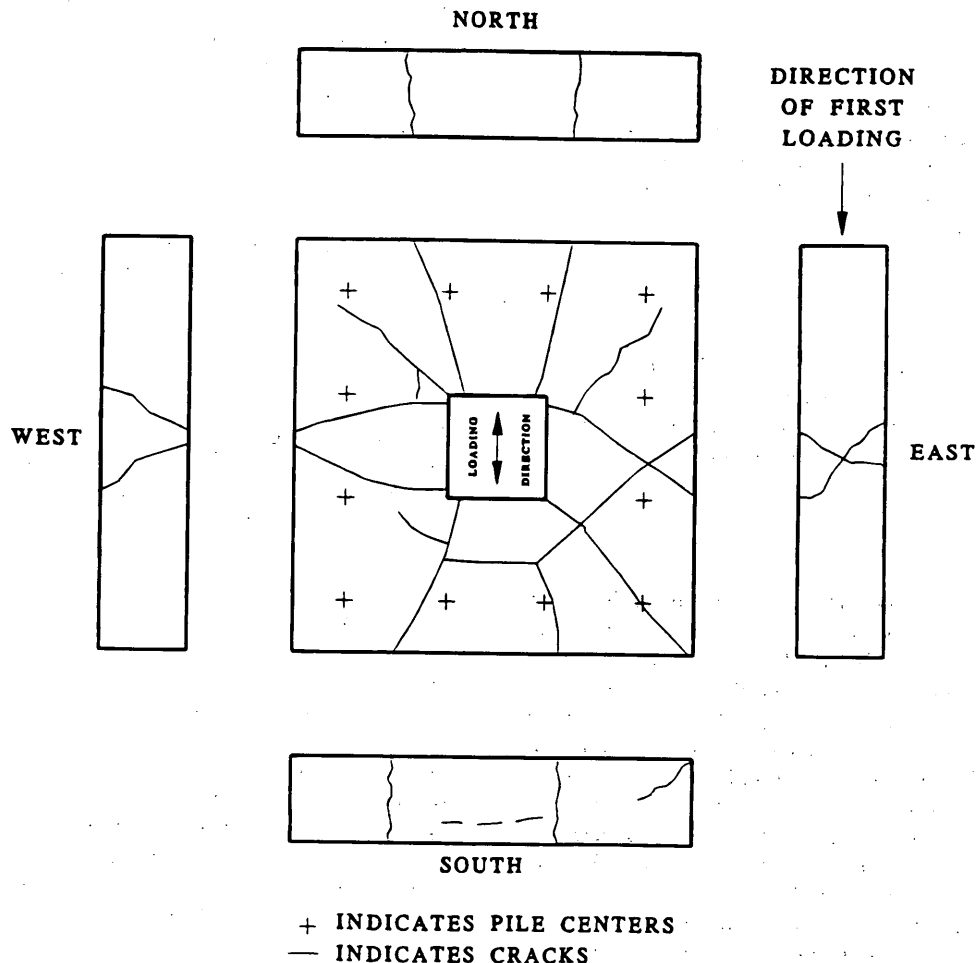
Cracking patterns in pile cap of Specimen No. 1.
